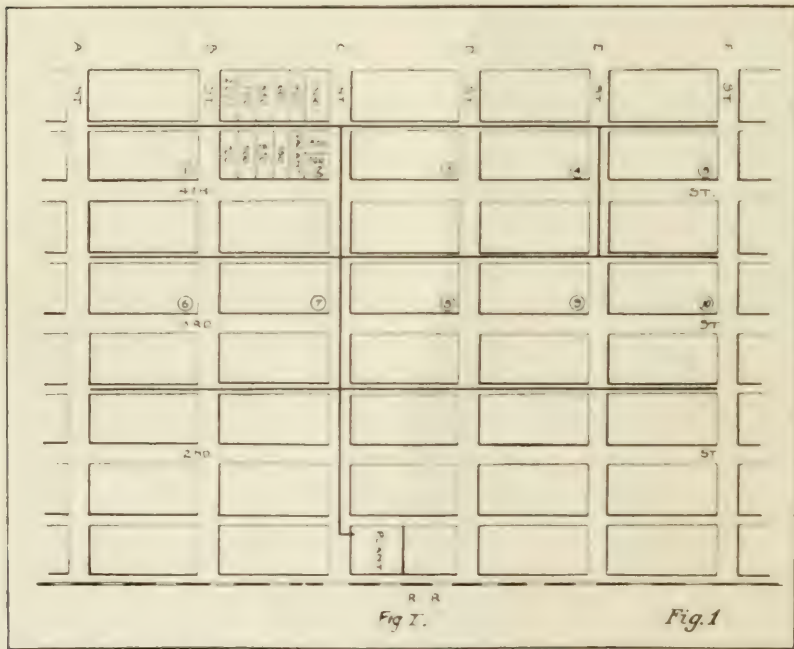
BLOCK PLAN OF TYPICAL CENTRAL STATION HEATING SYSTEM
